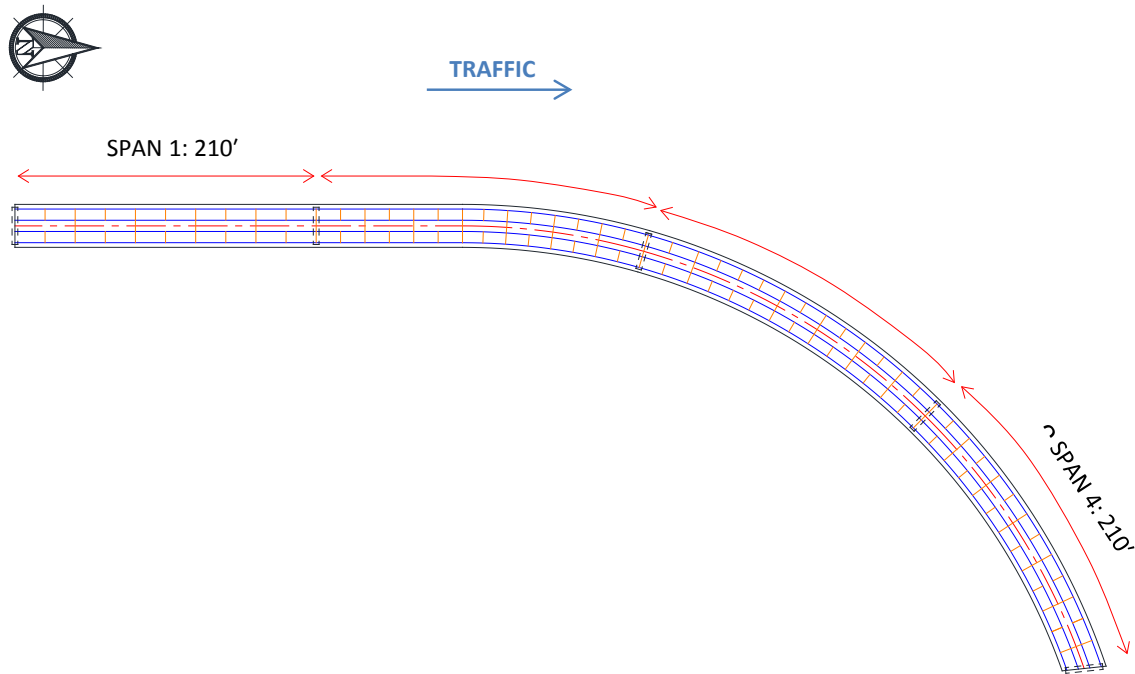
Dimensioned plan view of the US-290 Bridge.
